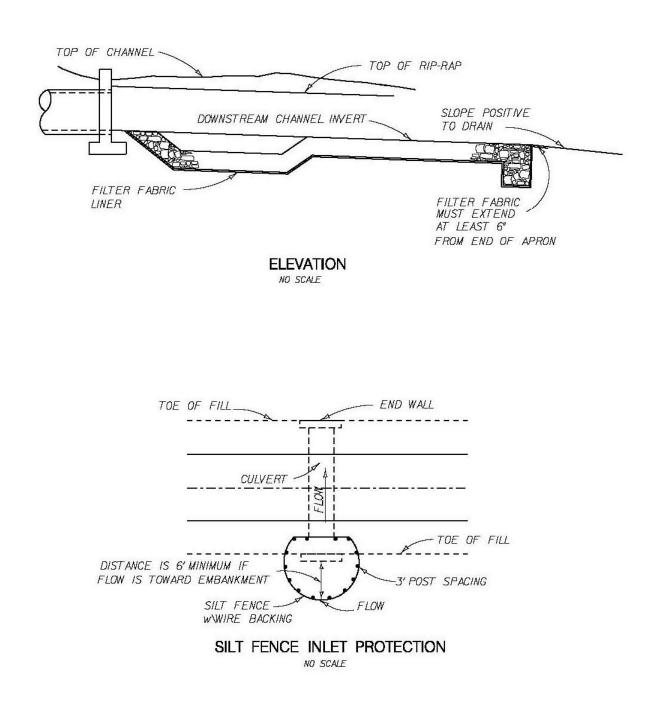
Rock Outlet and Culvert Inlet Protection
